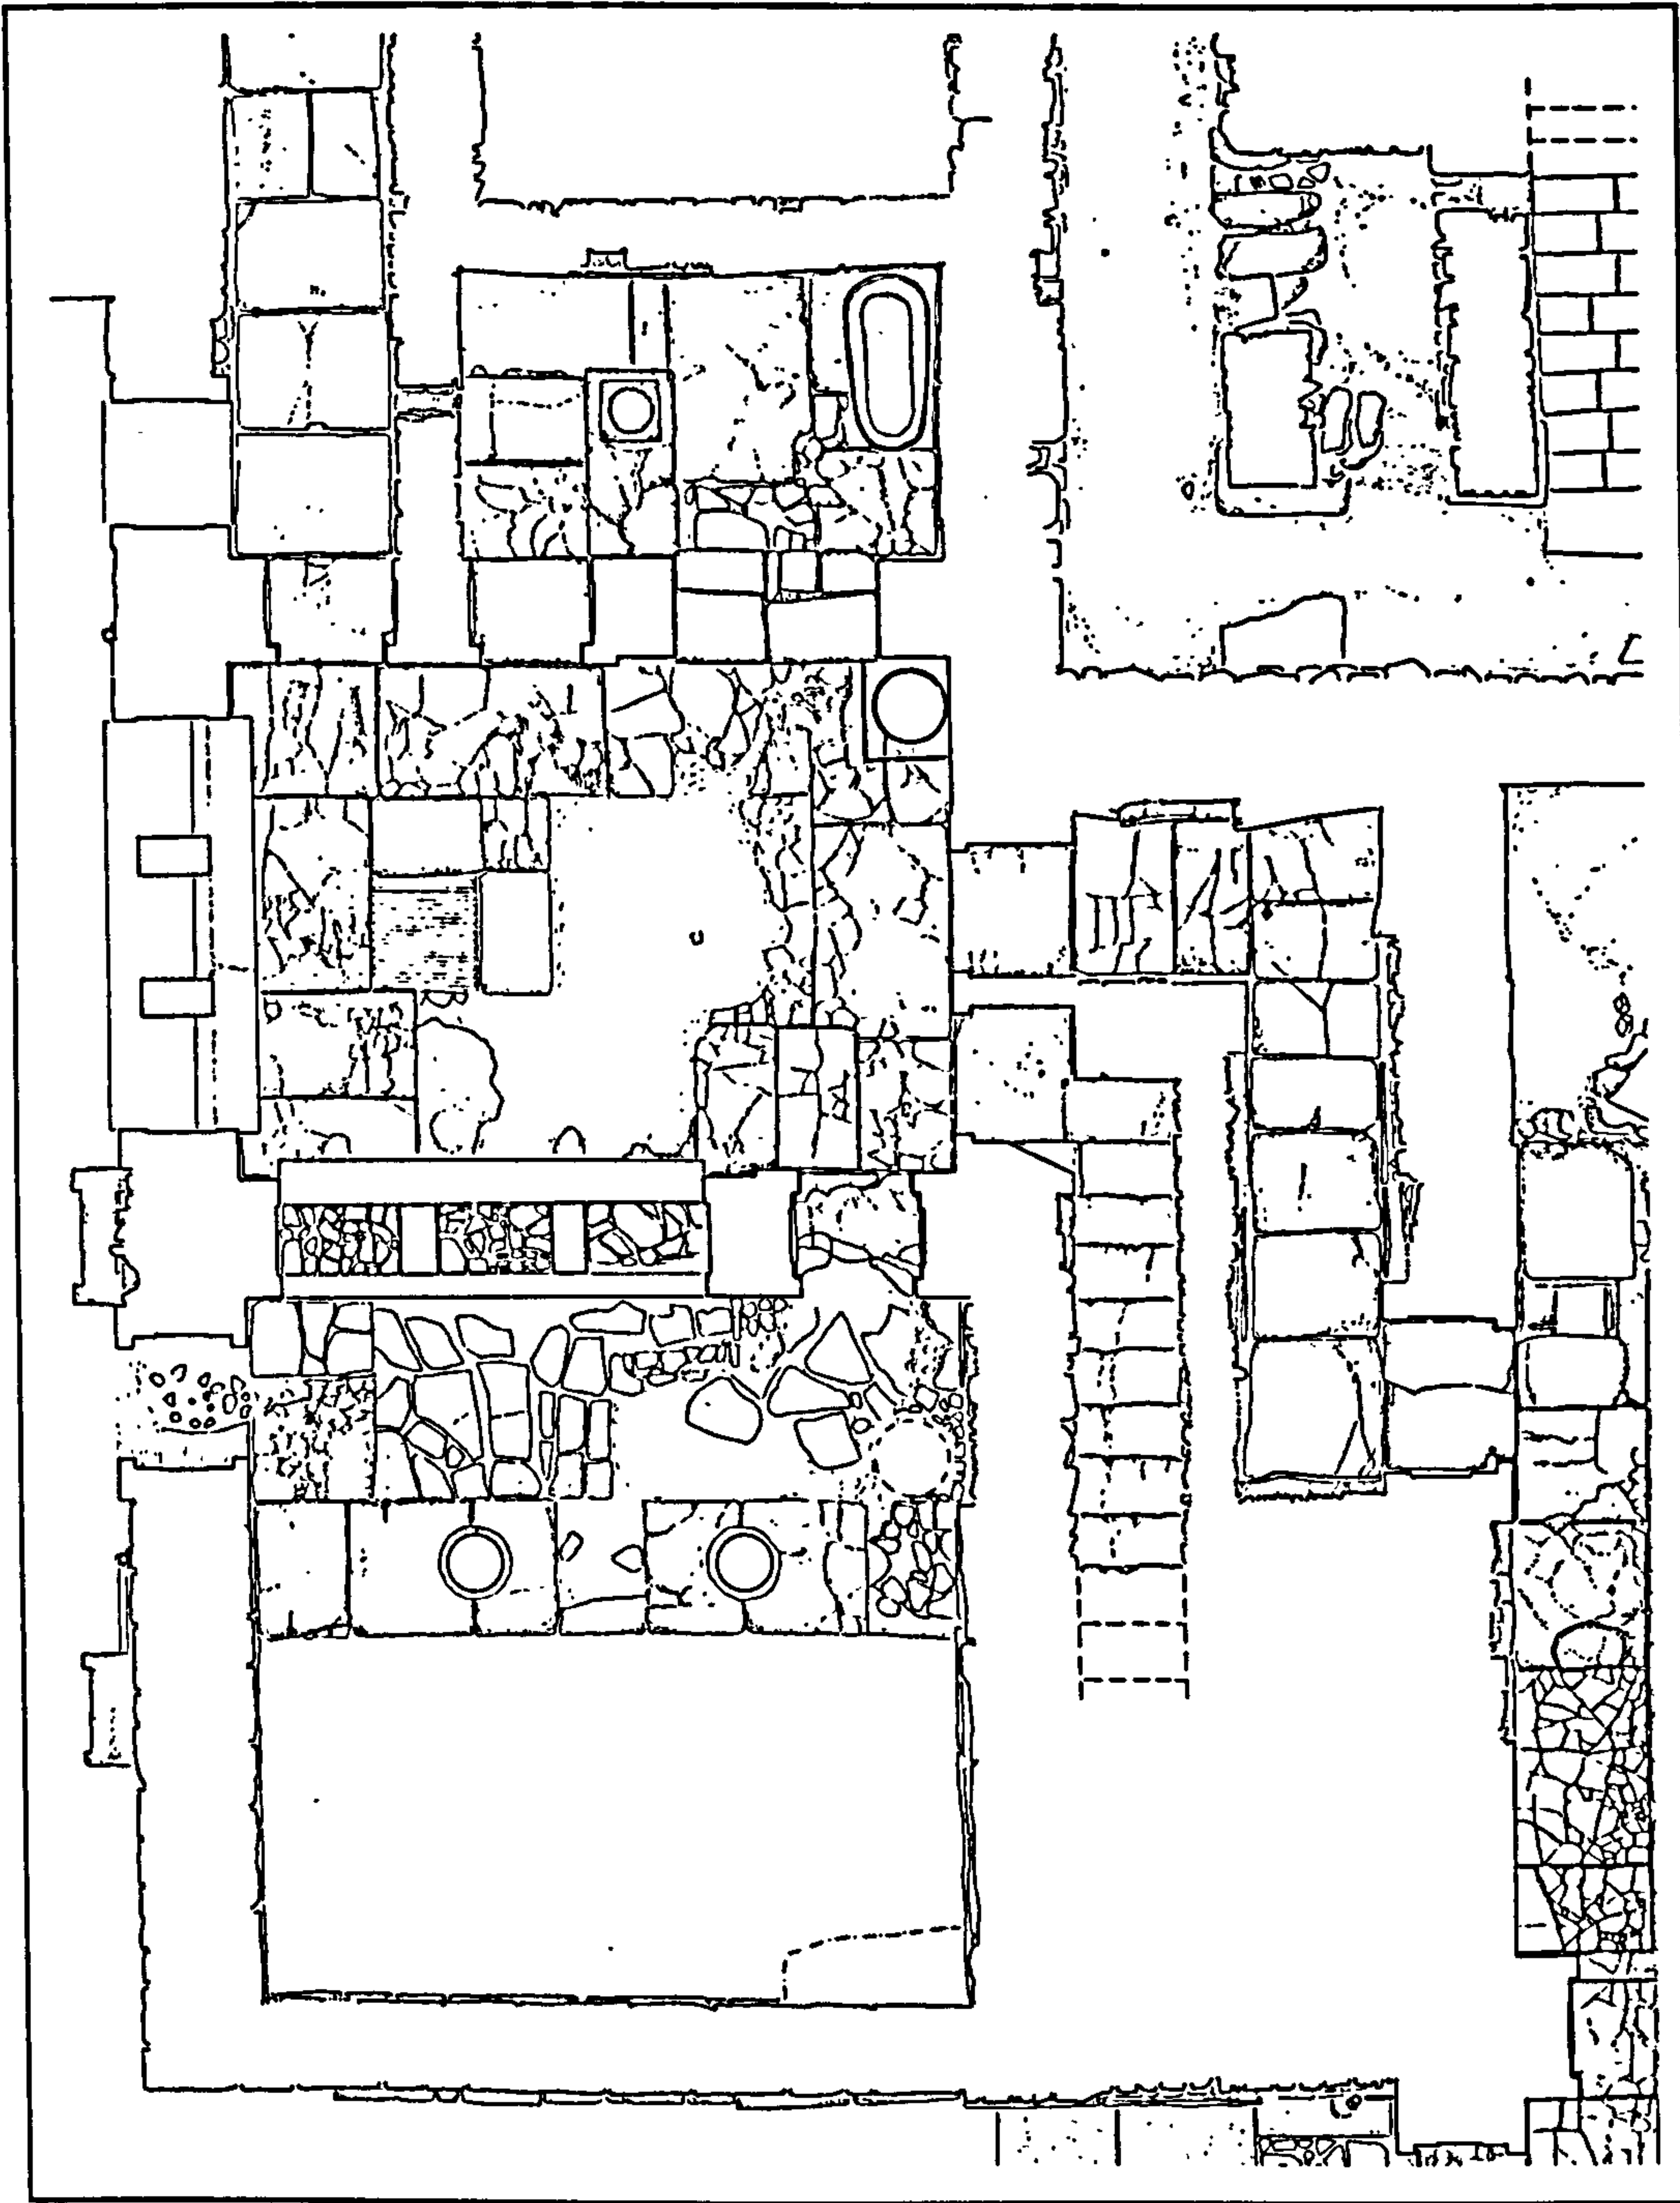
Ground plan of the Queen's Megaron and adjoining areas.
